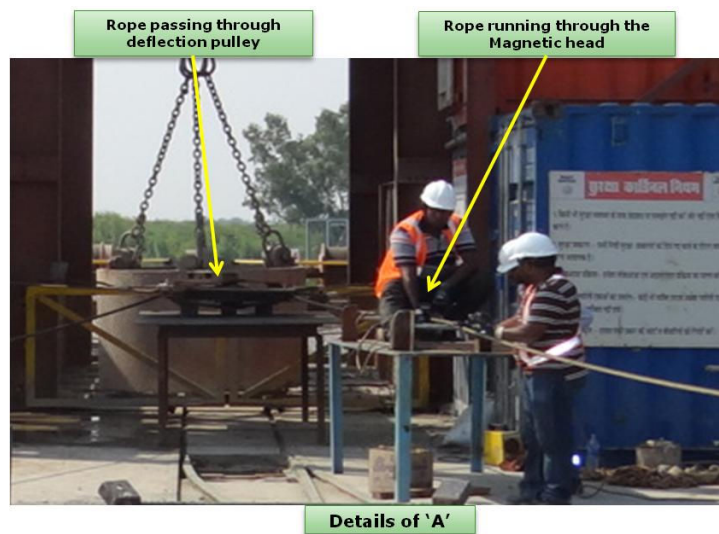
Special arrangement made at the site for testing the winch ropes, South Ventilation Shaft
